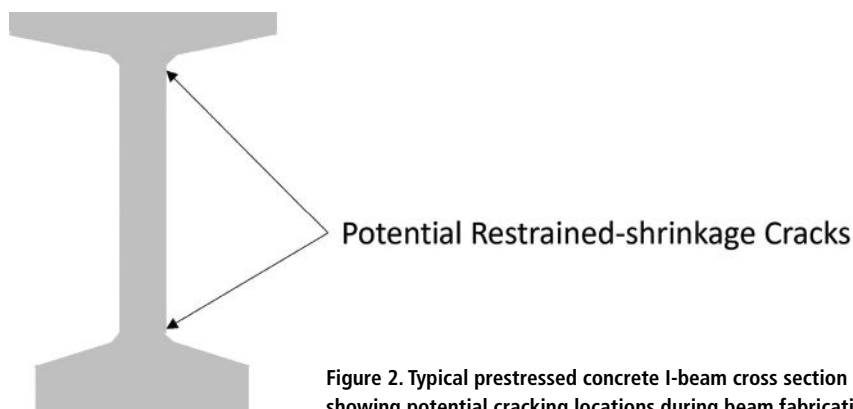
Typical prestressed concrete I-beam cross section showing potential cracking locations during beam fabrication.
